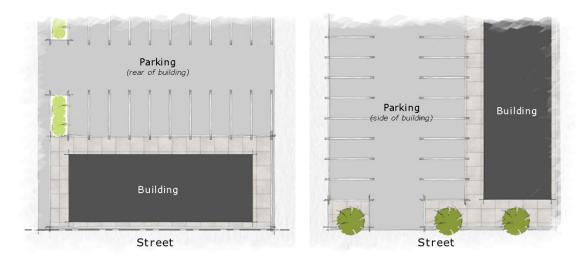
Off-street parking may not be placed between a fronting building and the street.
